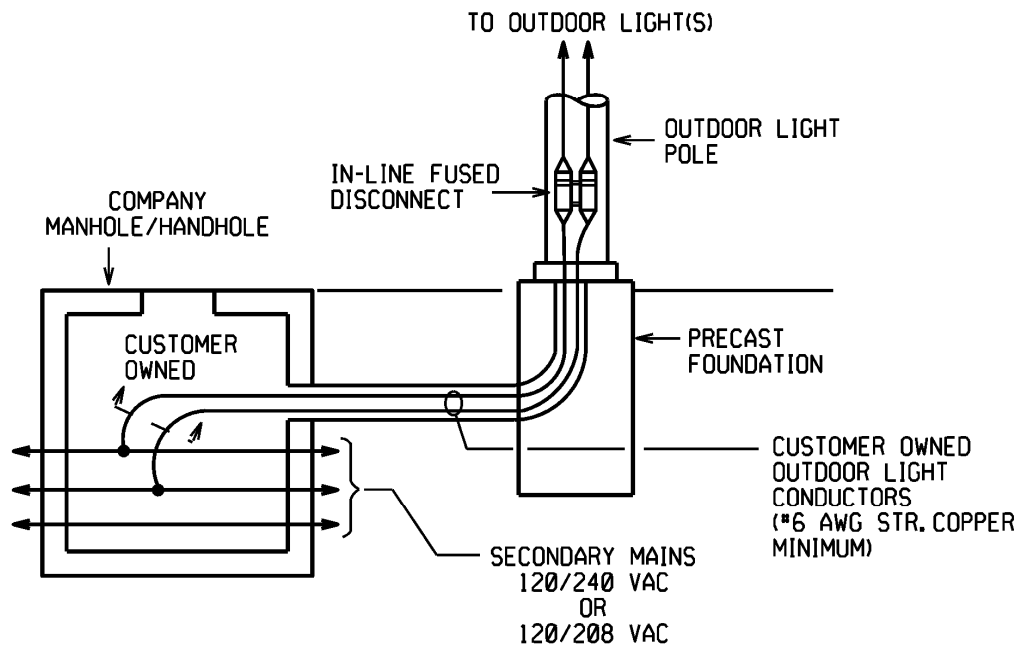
Connection of Underground Supplied Customer Owned Outdoor Light to National Grid Handhole or Manhole – Non-Standard Connection
